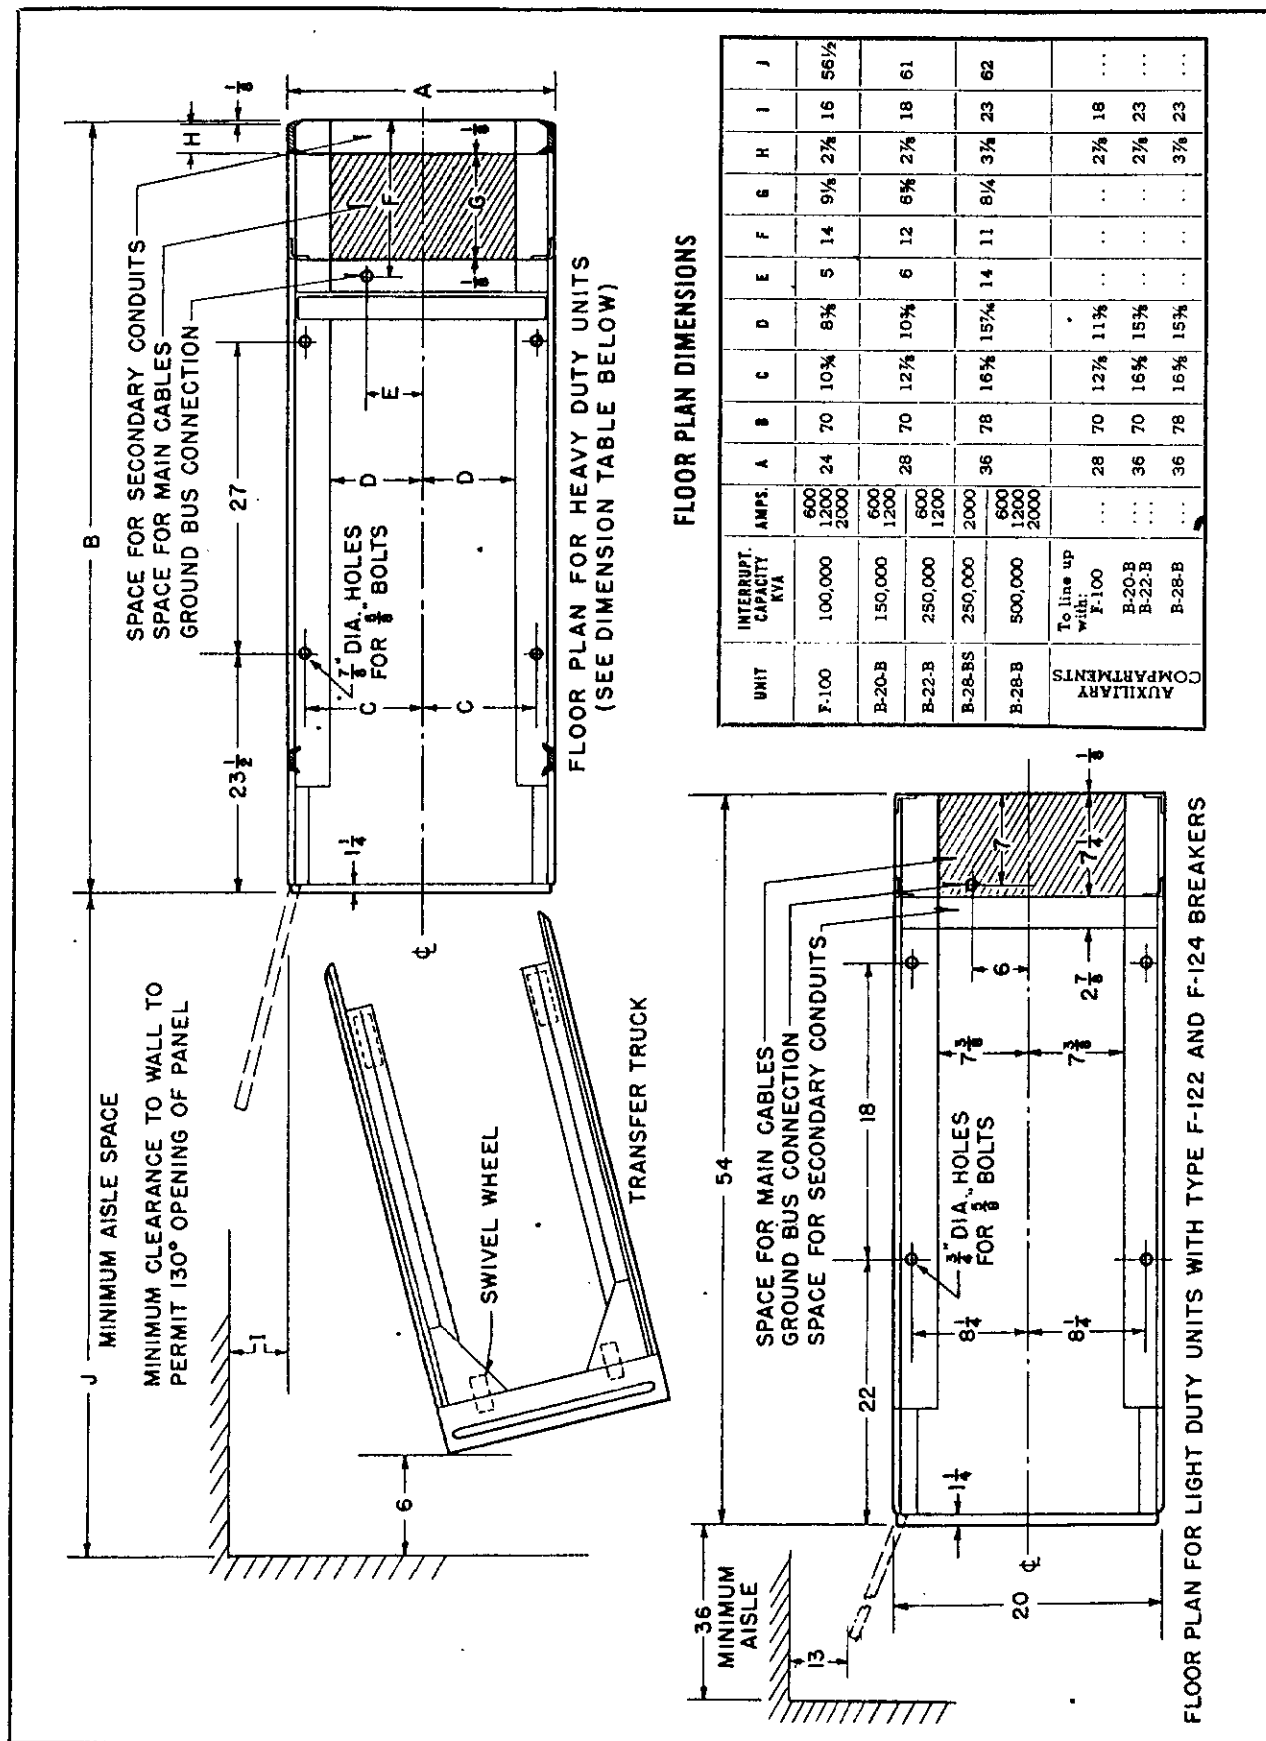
Typical Floor Plans for Indoor Metal-Clad Switchgear
